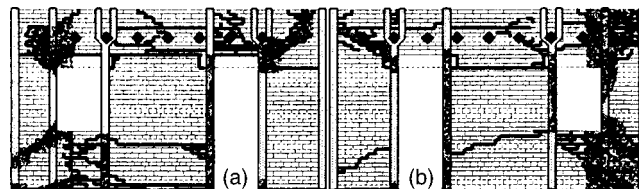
Crack pattern on shear wall repaired with Tyfo after cyclic test: (a) west wall and (b) east wall (shaded area indicates Tyfo material debonded)
